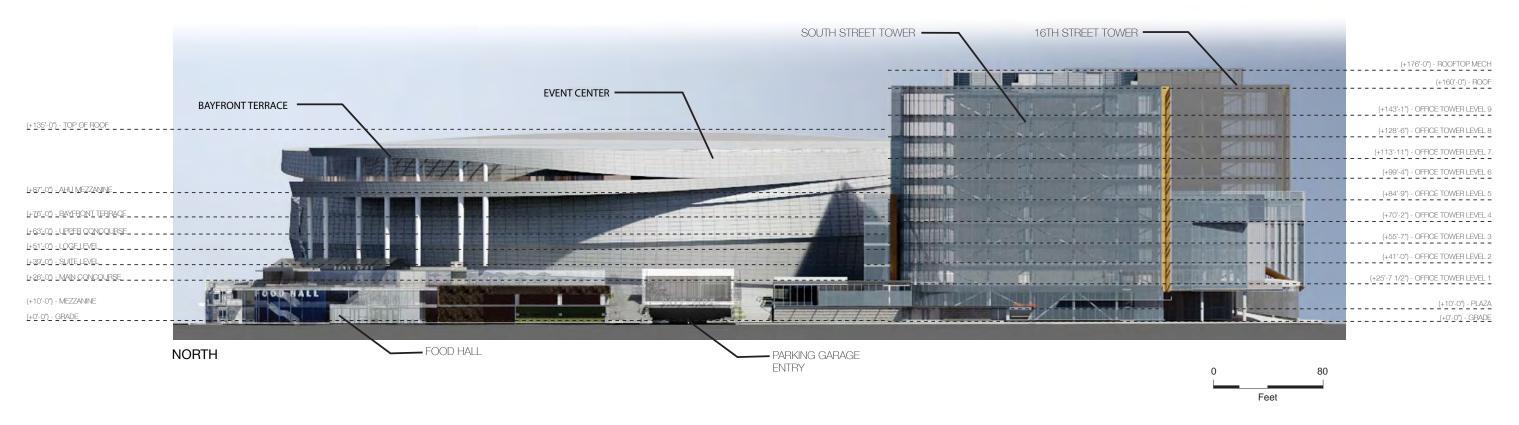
, top illustration, presents the south elevation (looking north towards Blocks 29-32 from 16th Street). The proposed event center, and the office and retail building at the corner of 16th and Third Streets dominate the foreground, and both the main garage/service entry and the event center theater entrance are visible from this perspective.
